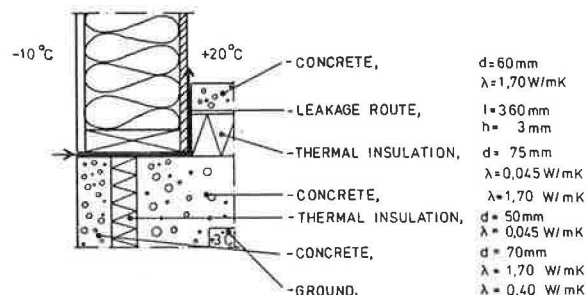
Heating of leakage air in crack between wall and foundation structure
